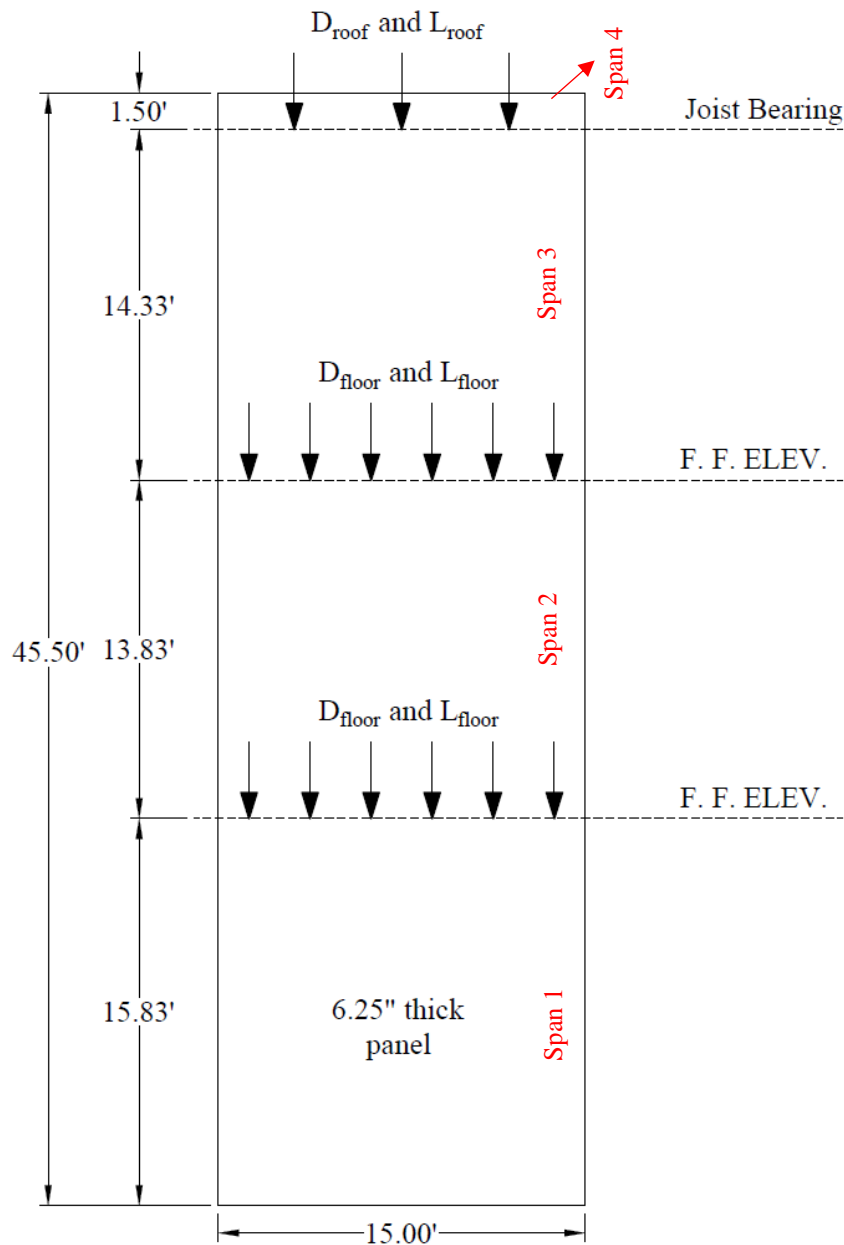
Reinforced Concrete Multi-Story Tilt-Up Wall Panel Geometry
